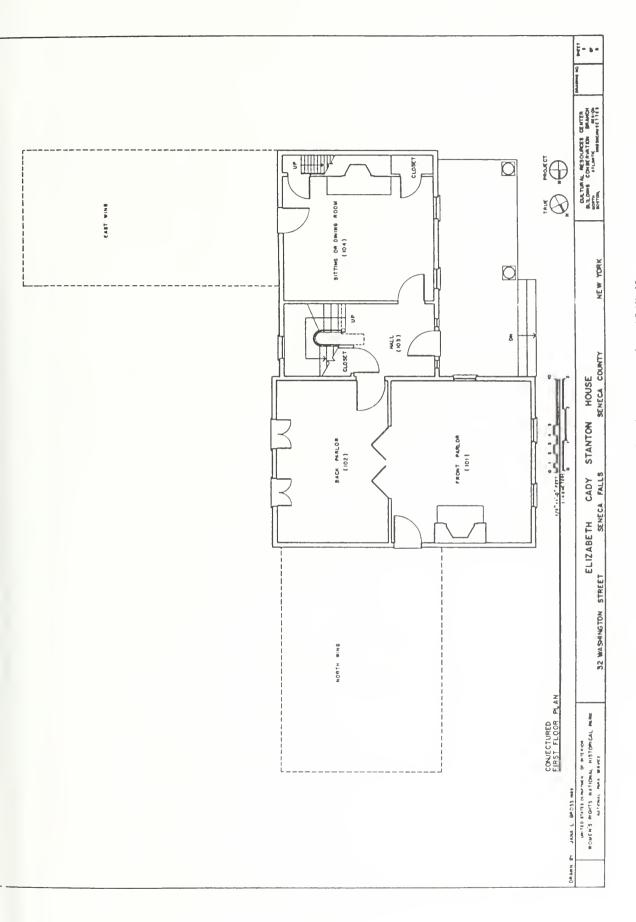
Stanton House: conjectural first-floor plan, circa 1847-62.
